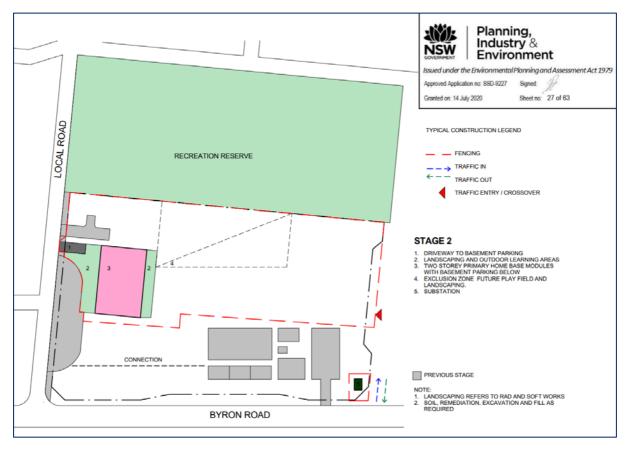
| Stage 2 site plan – as approved (Source: SSD-9227 Approved Plans)
